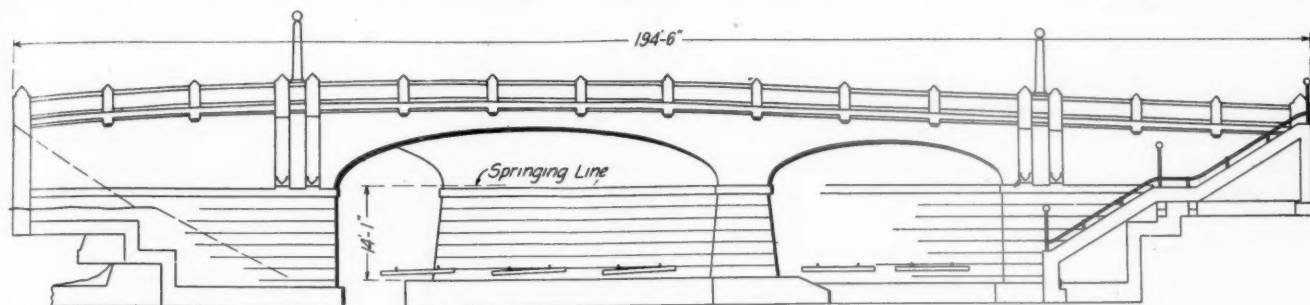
An Unsymmetrical Two-Span Arch Bridge Over the Tracks at Sneed's Crossing
